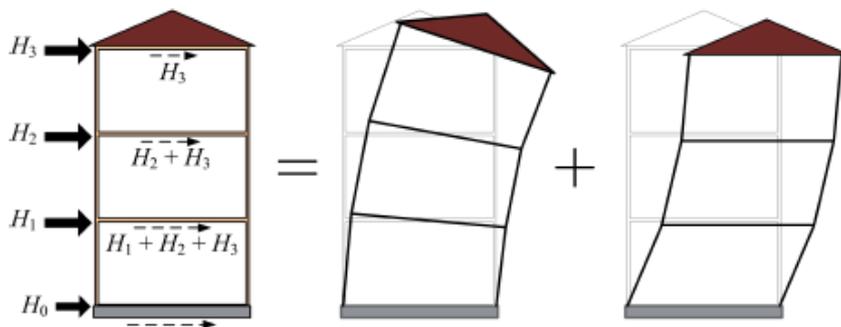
Frame stability regarding bending- and shear deformations. (Källsner & Girhammar 2008)
